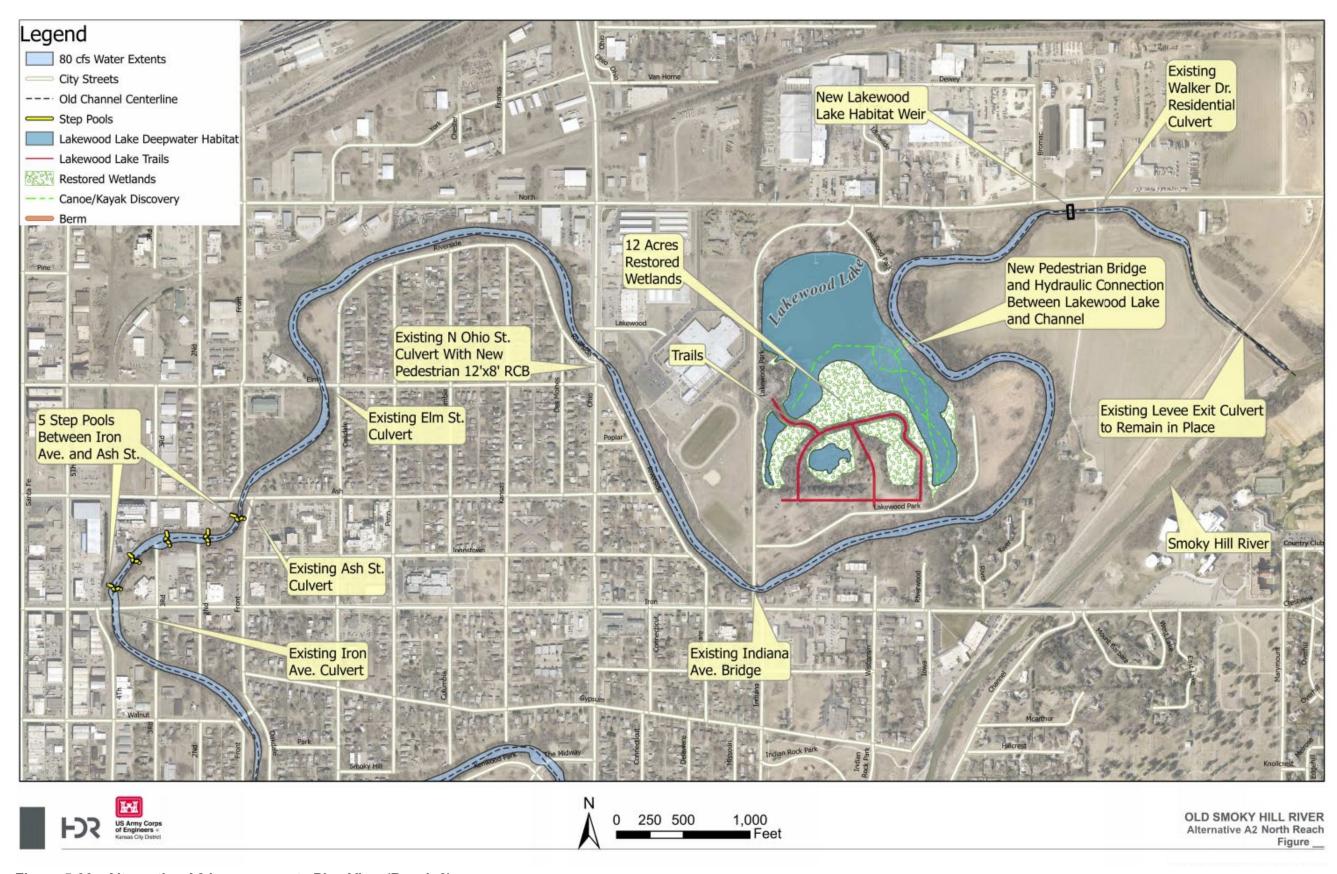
Alternative A2 Improvements Plan View (Reach 2)
